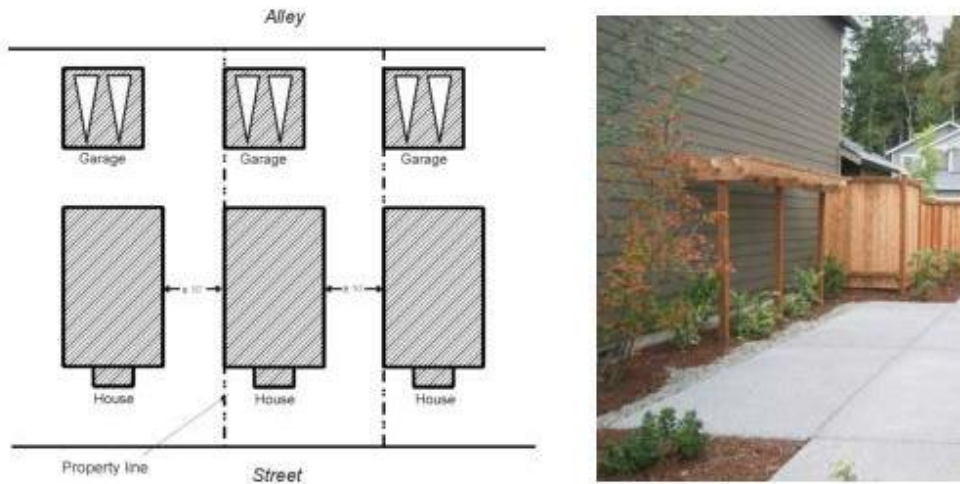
(A). Zero lot line layout example (left). The right image shows the side yard and privacy wall for a zero lot line house.
